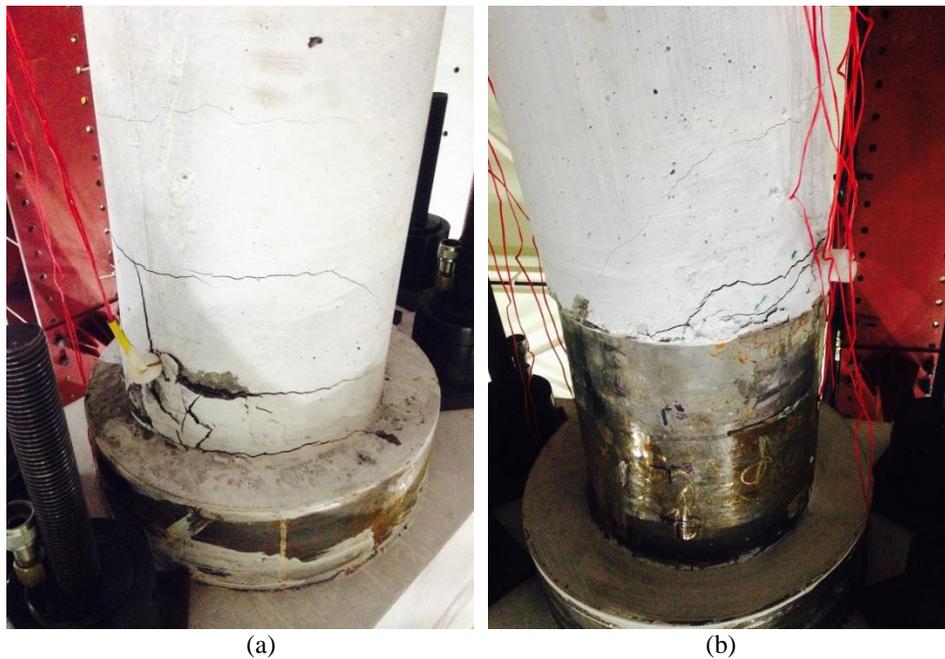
(a) Deformed specimen 1 and (b) deformed specimen 2 (steel tube).
